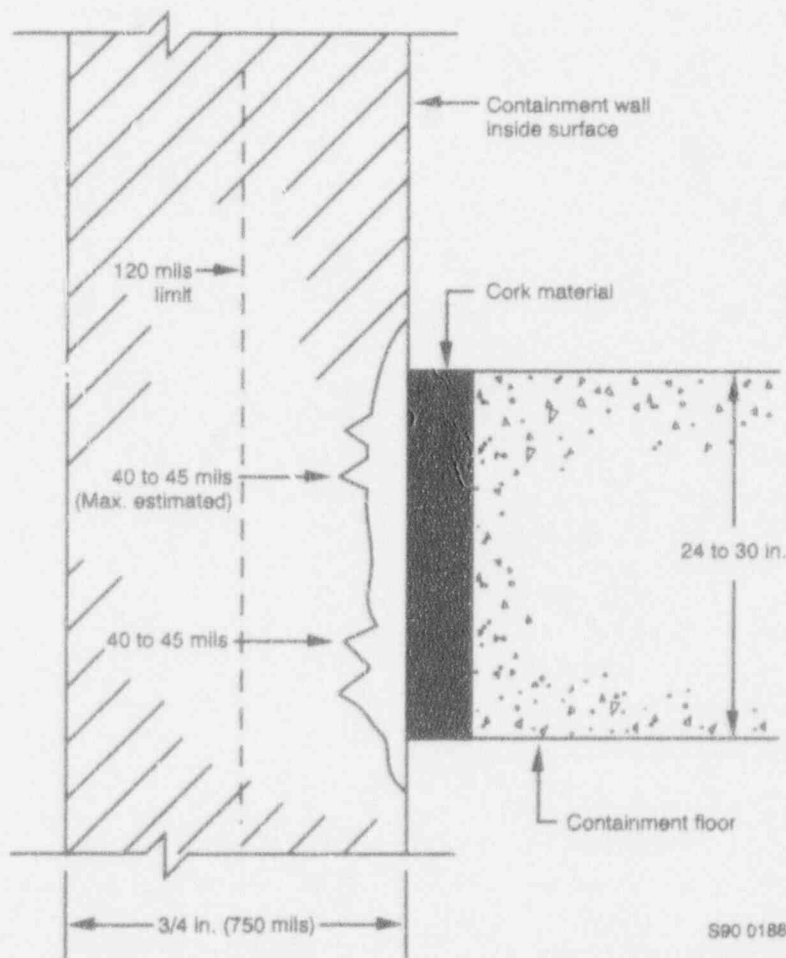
Cross section of McGuire Unit 1 steel containment vessel at 247 to 302 degrees, showing worst-affected areas at elevations 225 m (738 ft-3 in.) and 233.7 m (766 ft-8 in.).
